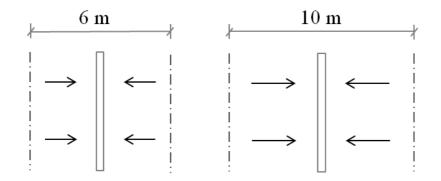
Assumed width of the influence area of the floor for which the beams were designed.
